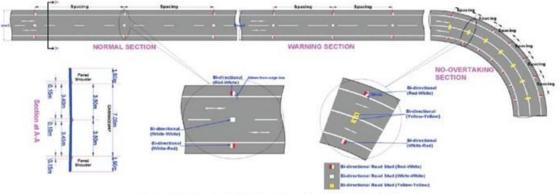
Longitudinal Marking & Roads Studs for a Two Lane Road
